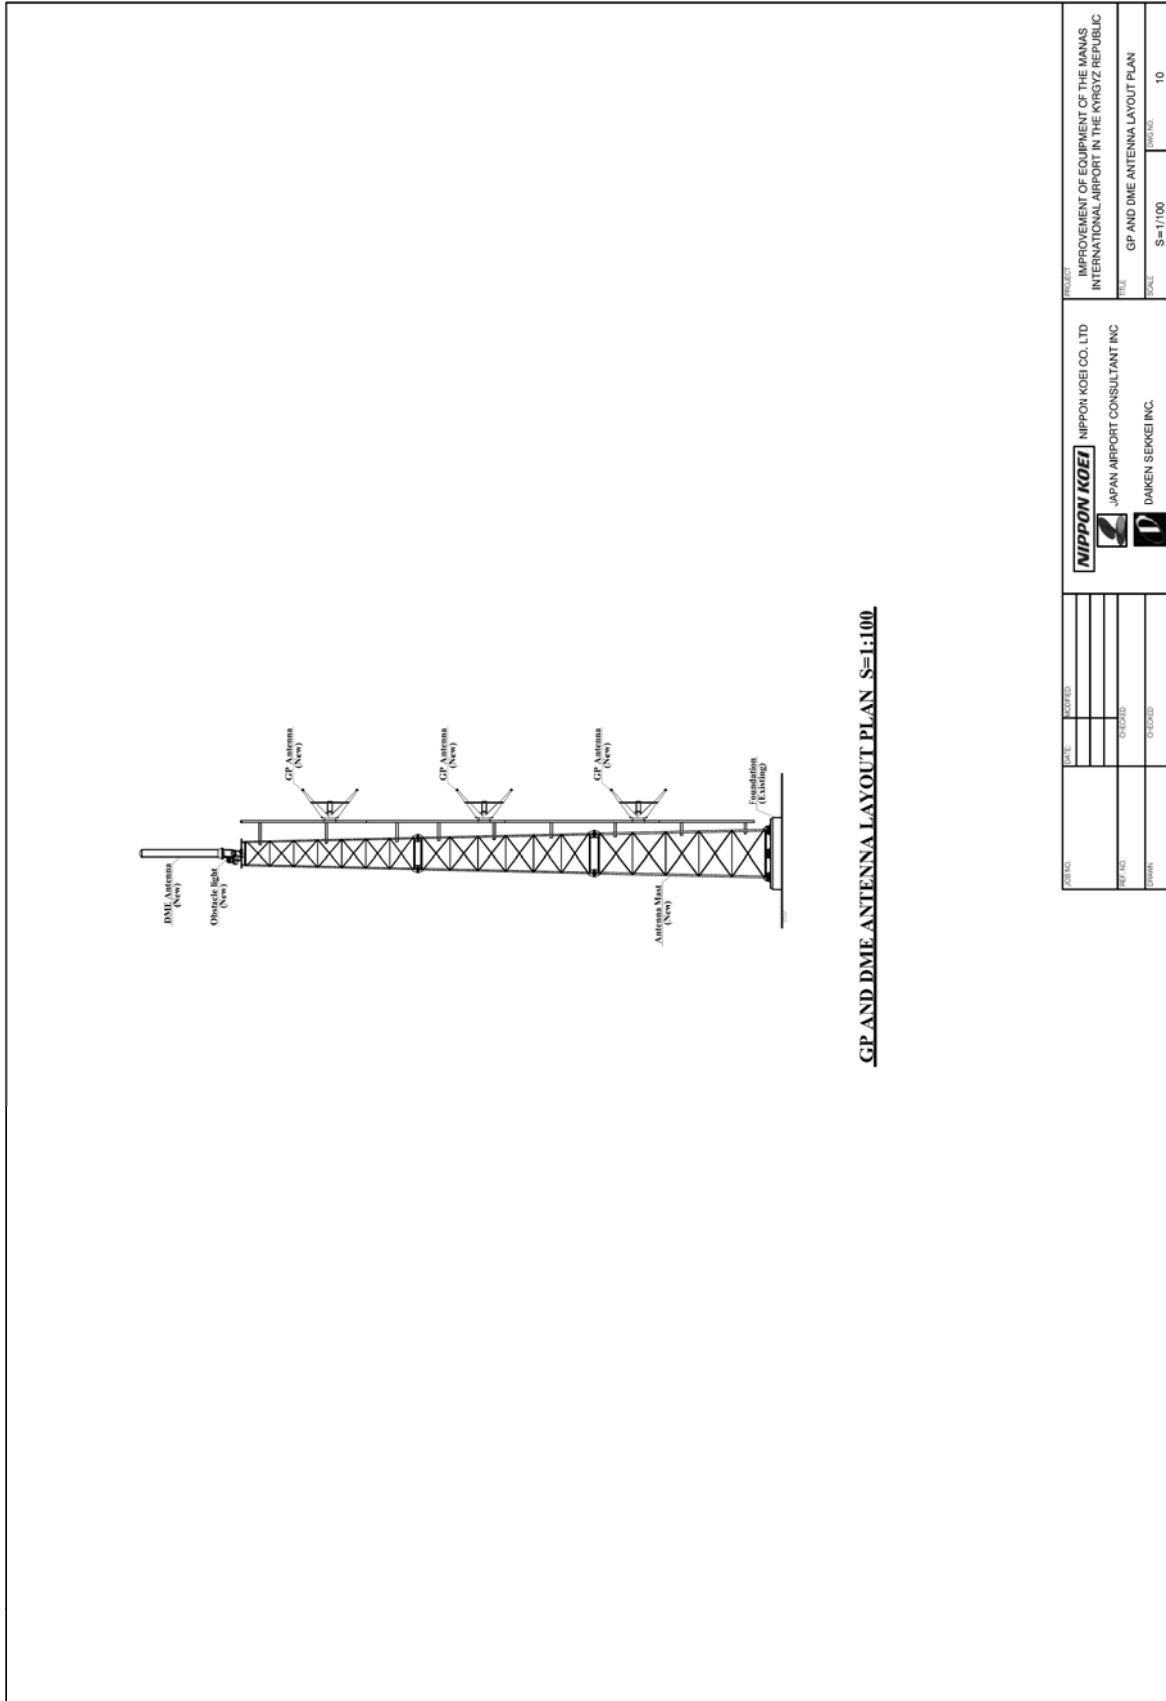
GP and DME Facility Layout Plan for Runway 08 Side
